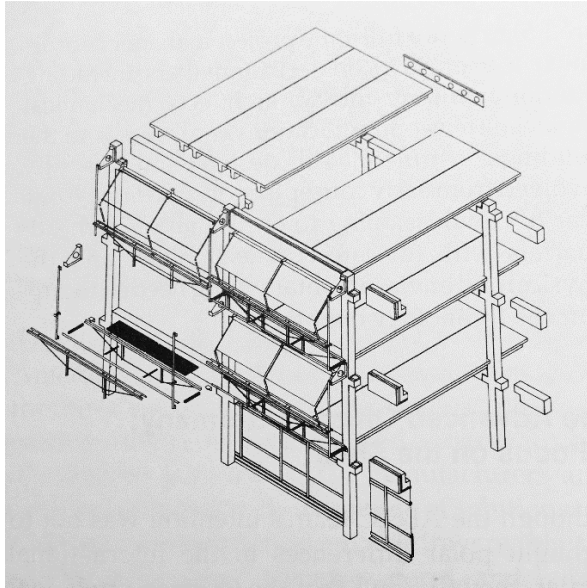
The IAM building in Braunschweig, Germany, shows the layered façade for sun control, daylight management, natural vegetation, fire egress, and maintenance. Source: *German Building Studies
